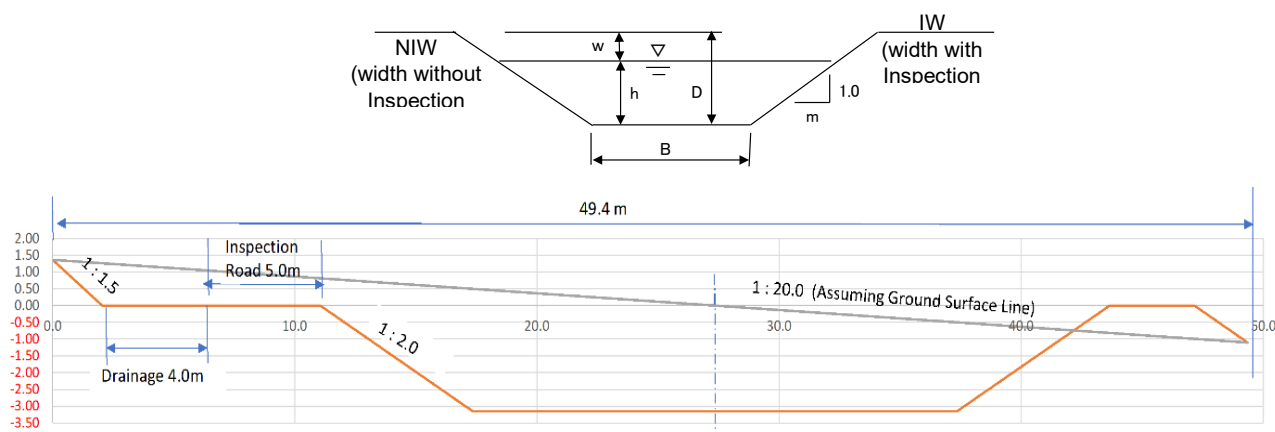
A Typical Cross Section of Primary Canal (Komeriing Extension No.4-1)
